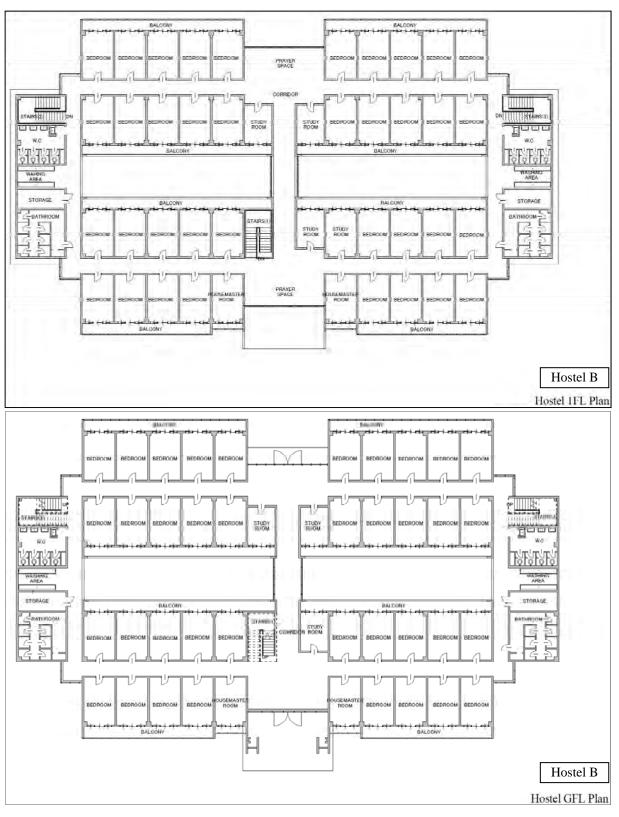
Plan of Hostel B (Ground Floor & 1st Floor)
